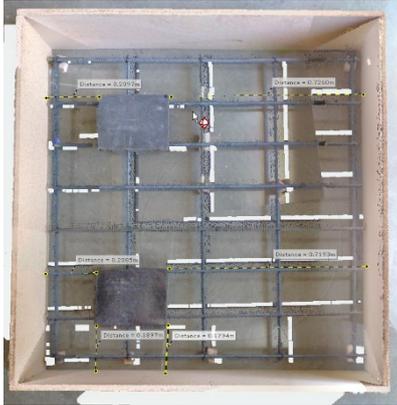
New layout with steel embed plates shifted to the left (as-built 2).
